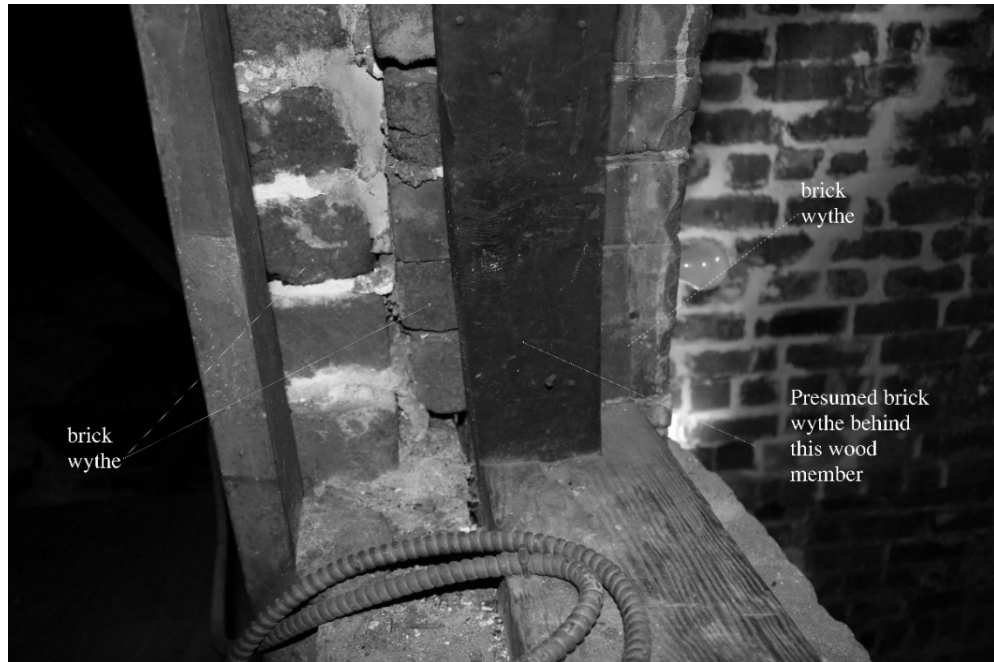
Image of a multi brick wythe wall in the bell tower of the First African Baptist Church (Photograph by the author)
